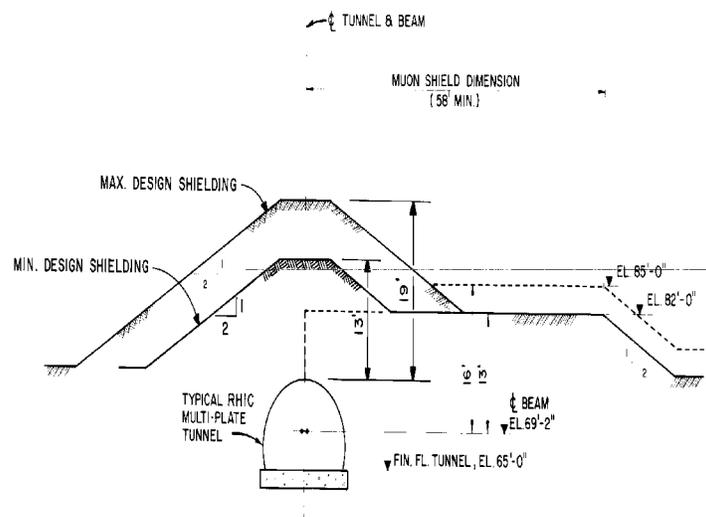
Typical section through RHIC tunnel showing maximum and minimum earth cover.
